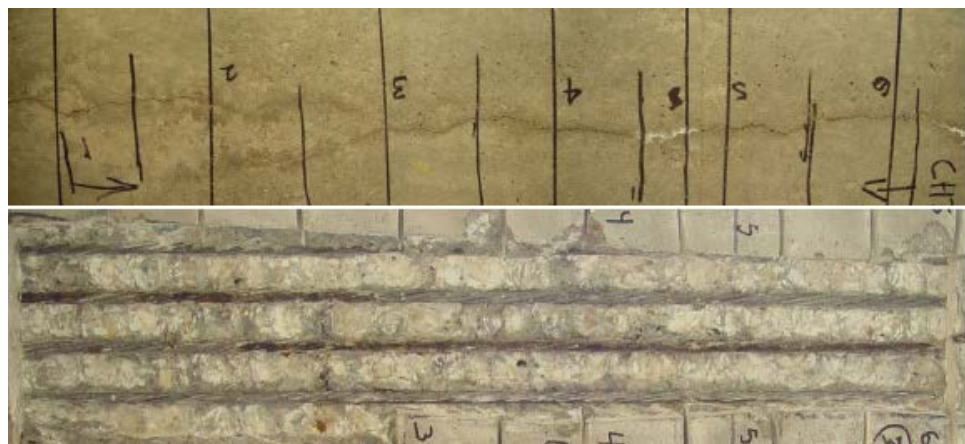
Longitudinal Cracks (Top) and Corresponding Corroded Prestressing Strands after Concrete Removed (Bottom)
